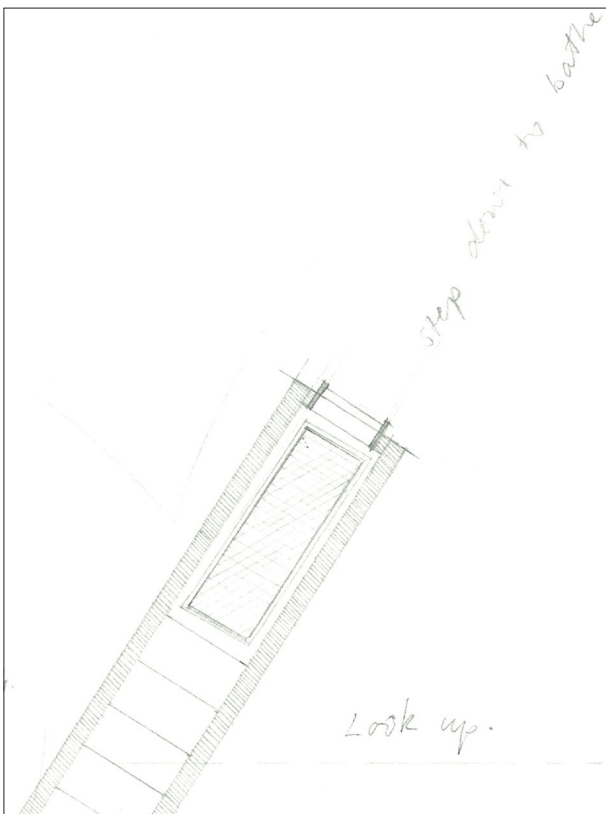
Segment of a plan from 'The House of proteas from the garden and my favourite bowl.'
